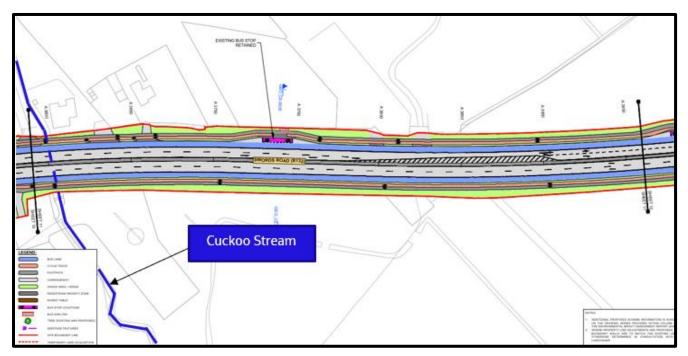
Proposed works around the crossing with Cuckoo Stream on R132 (around Ch. A03 + 600)
